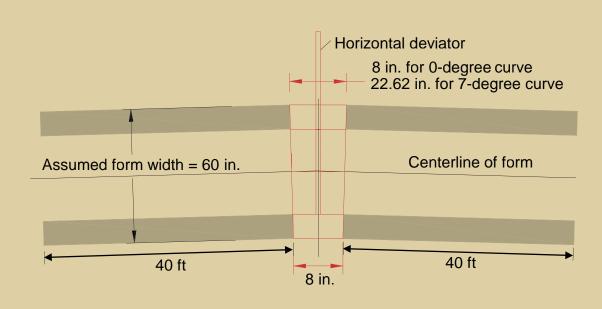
This plan view shows the joint form and deviator, which can be installed between two 40-ft-long standard forms. If an inside gap of 8 in. is assumed, then an outside gap from 8 in. to 22.62 in. would be required for 0 degrees to 7 degrees of curvature, respectively. Note: The drawing is not to scale. 1 in. = 25.4 mm; 1 ft = 0.305 m.
